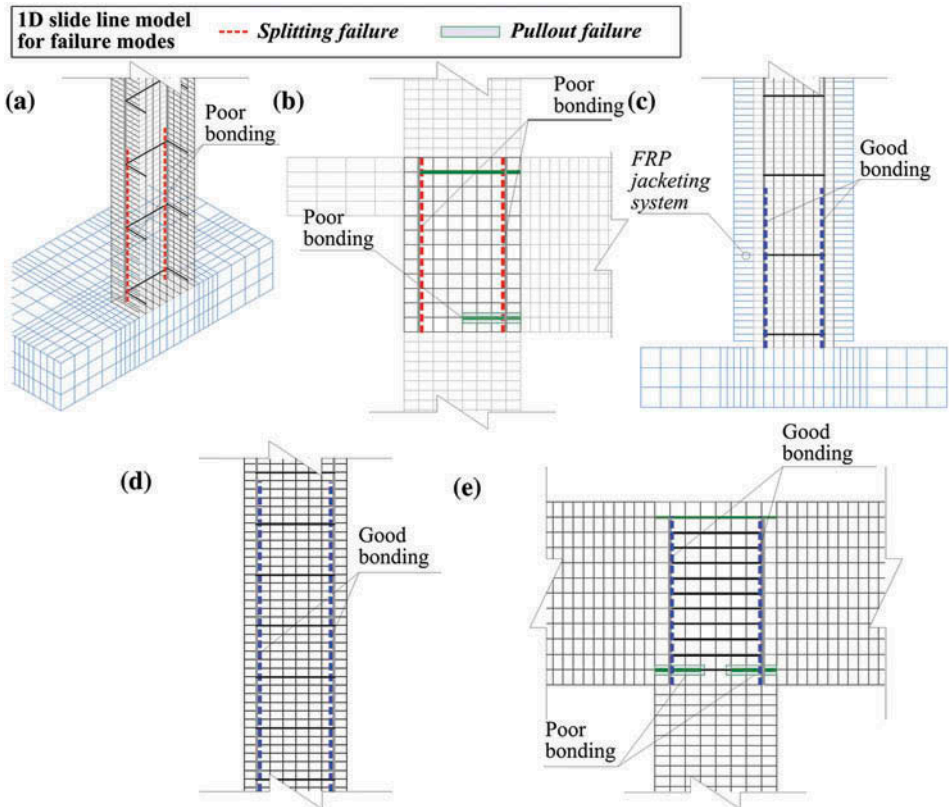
Examples of bond-slip modeling for failure modes and bonding conditions in LS-DYNA: (a) first-story as-built column; (b) first-story exterior beam–column joint; (c) first-story retrofitted column; (d) second-story column; and (e) second-story interior beam–column joint.
